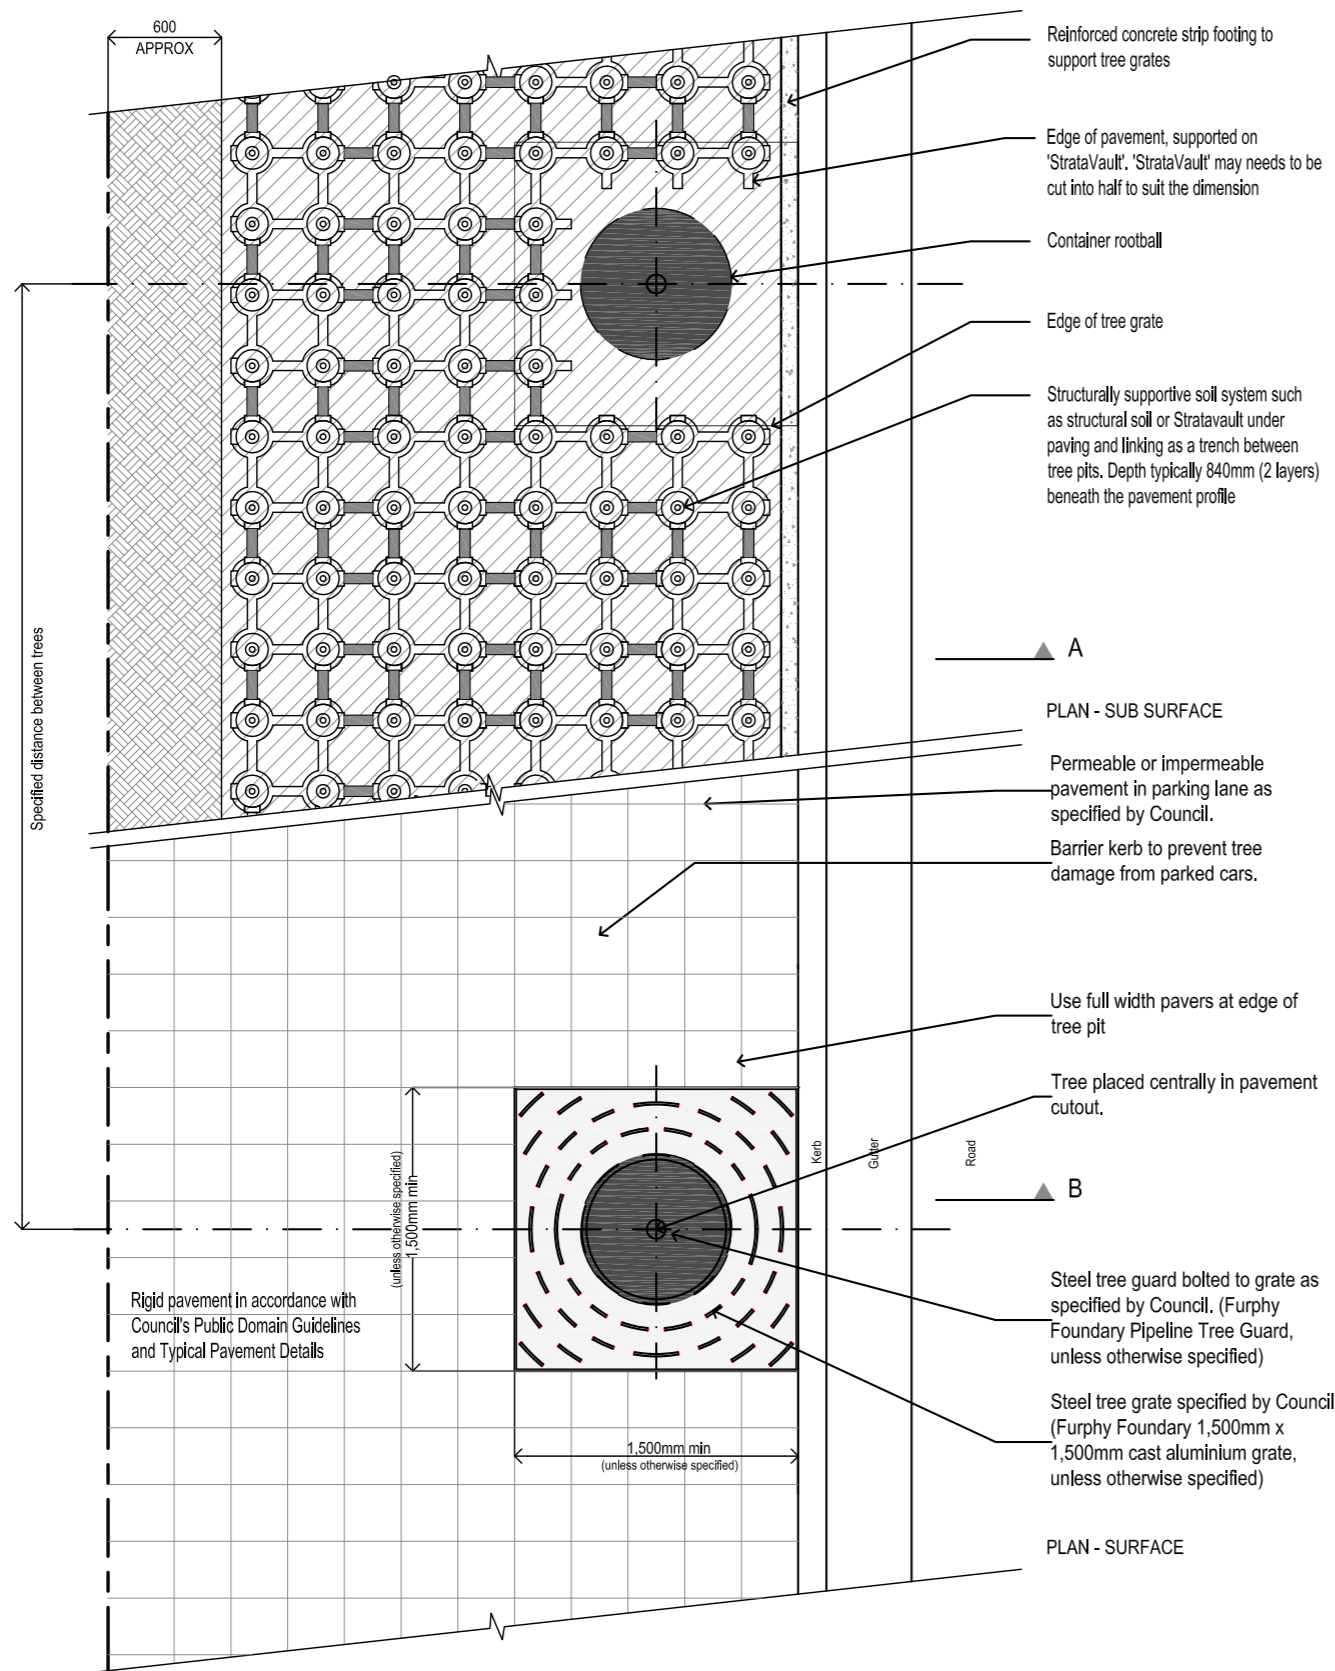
Street Tree Typical WSUD Pit Location in Footpath > 4000
